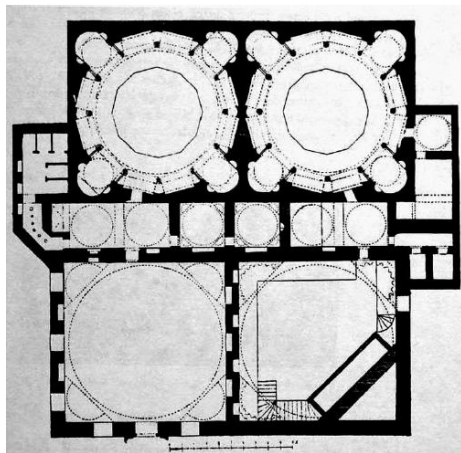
Çemberlitaş Hamamı layout, 1584 (Url-29).
